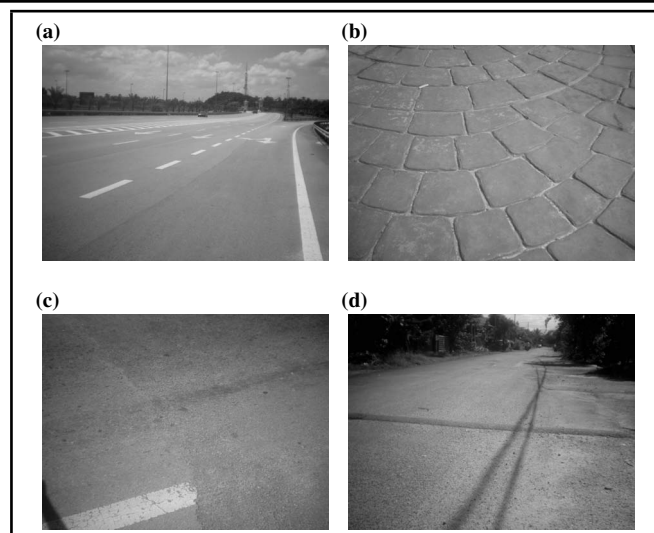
Road surfaces: (a) highway, (b) pavement, (c) suburban, and (d) bumpy.
